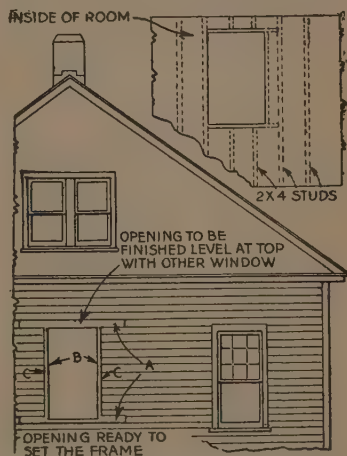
Inside and outside view of opening for replacing a new window frame.
